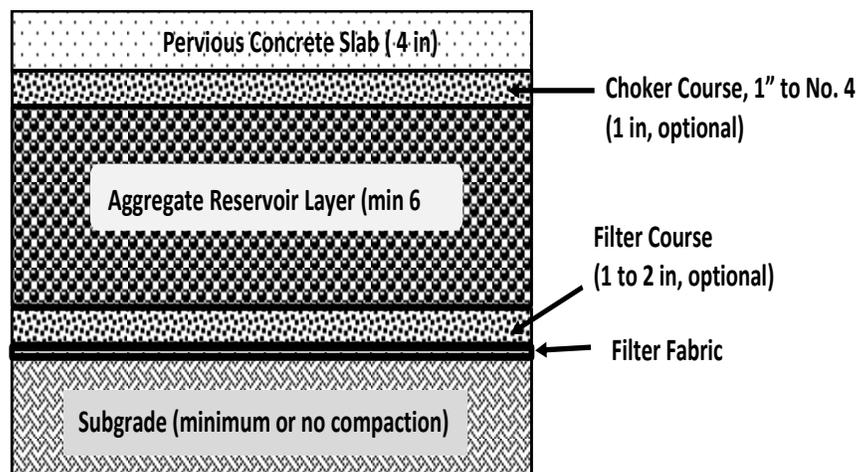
Typical Cross Section of Pervious Concrete for Sidewalks
